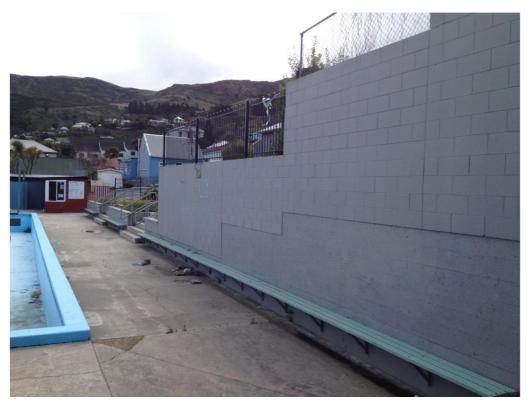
Adjacent concrete masonry block wall along driveway between Main Plant Room and Lean-to Shelter. The Main Plant Room is immediately to the right of this photo (view from south). Damage Description: Cracking and differential settlement of concrete masonry block wall.
